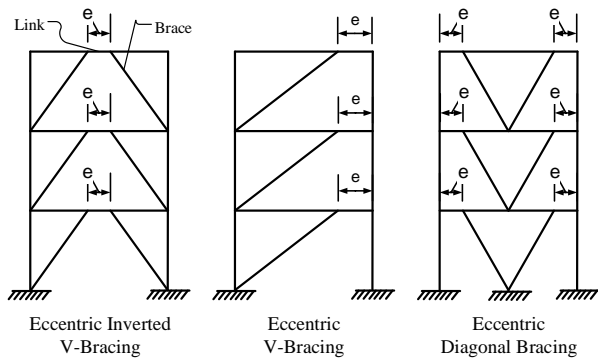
Eccentrically braced style. a) Eccentric Inverted V bracing, b) Eccentric Diagonal bracing, c) Eccentric V-bracing.
